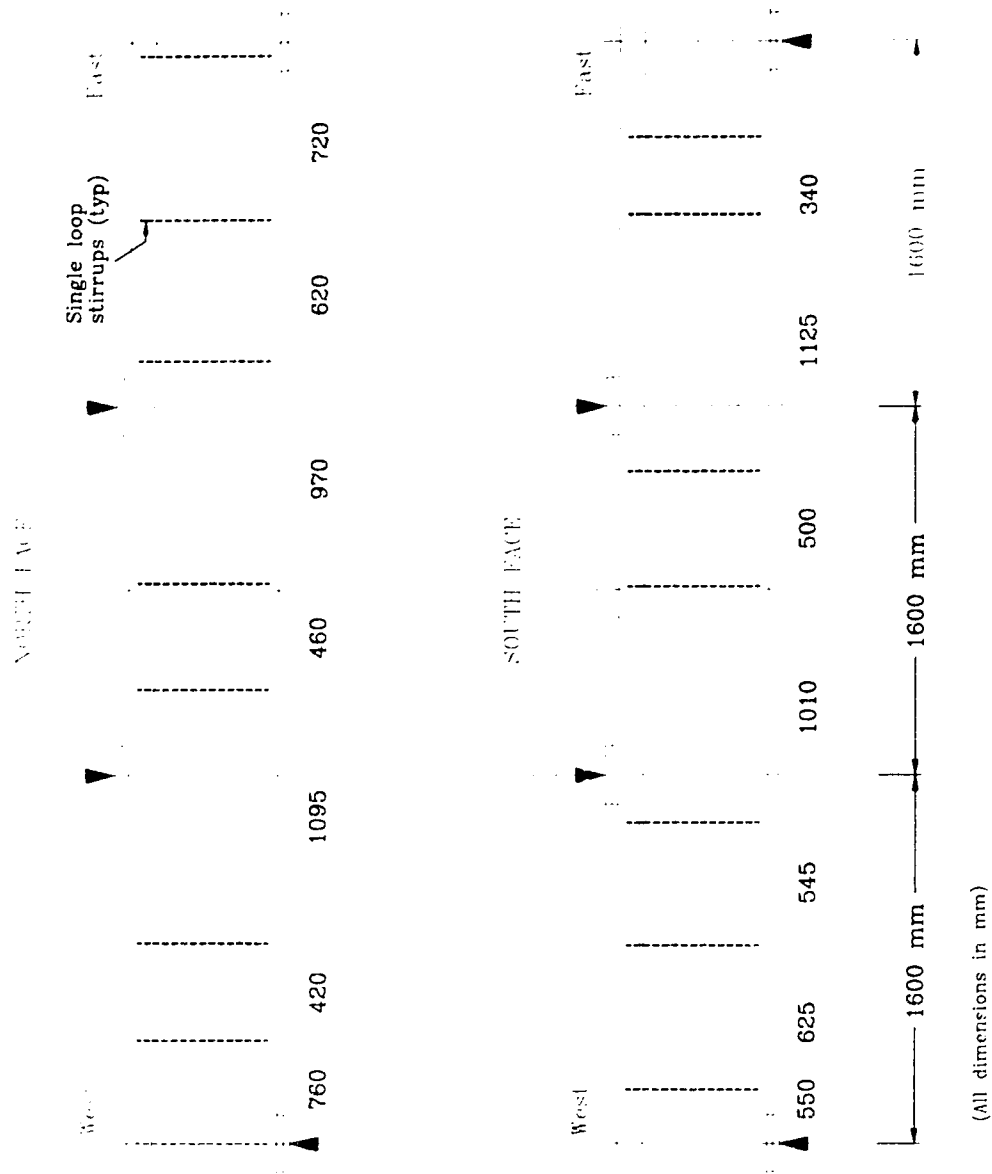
Girder 3 - Test set-up and stirrup locations
